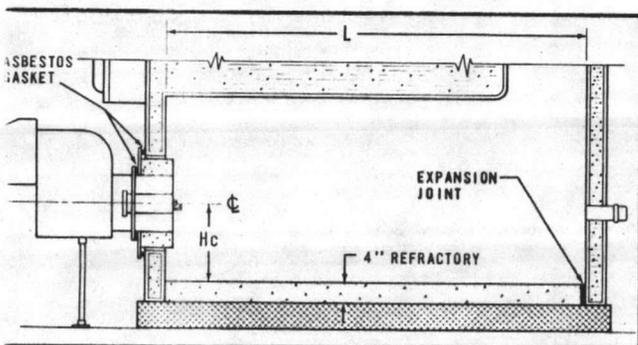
TYPE "R" BURNER INSTALLATION FIRING FORCED DRAFT BOILER
